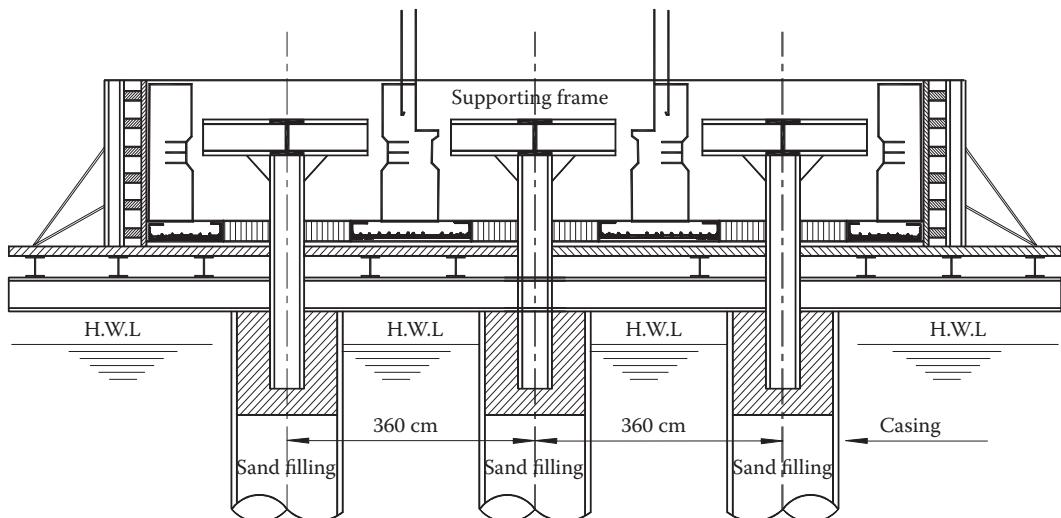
Erecting frames and fixing steel reinforcement of bottom and sides of pile cap steps 8 and 9.
